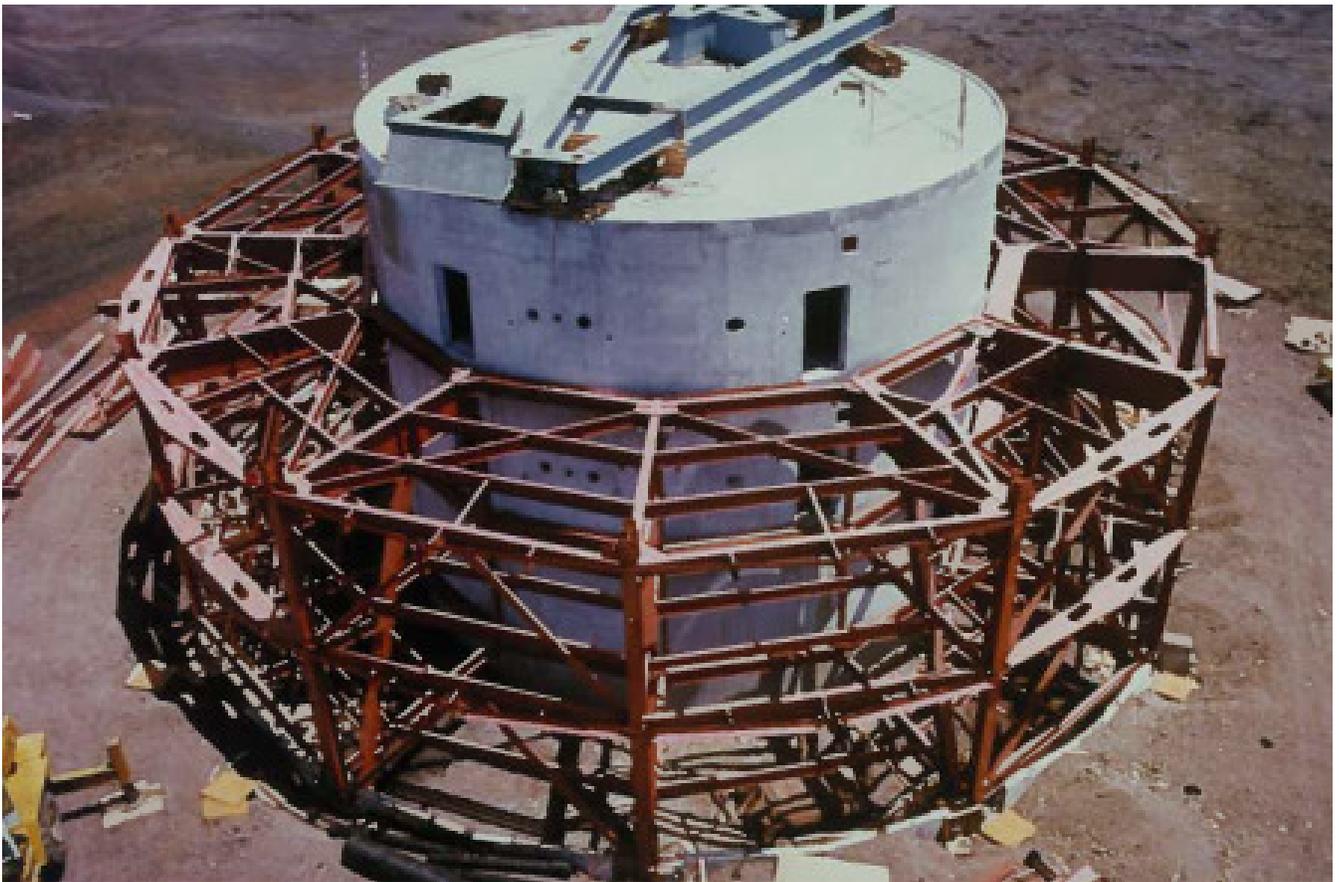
CFHT pier building during the dome support construction (CFHT, 1974, with permission)
